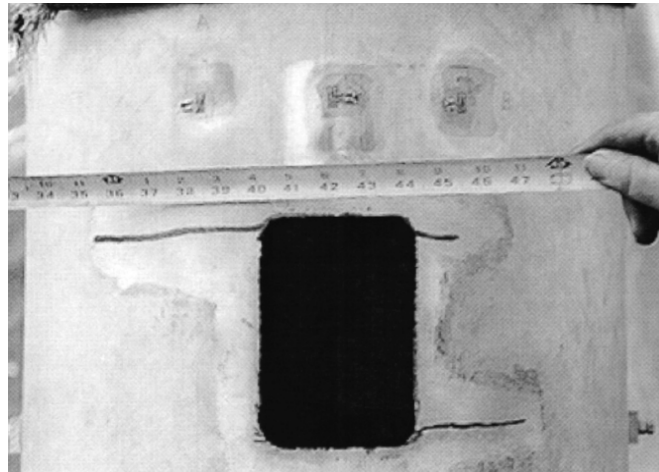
Cracking at the corners of the conduit hole in specimen ABI
